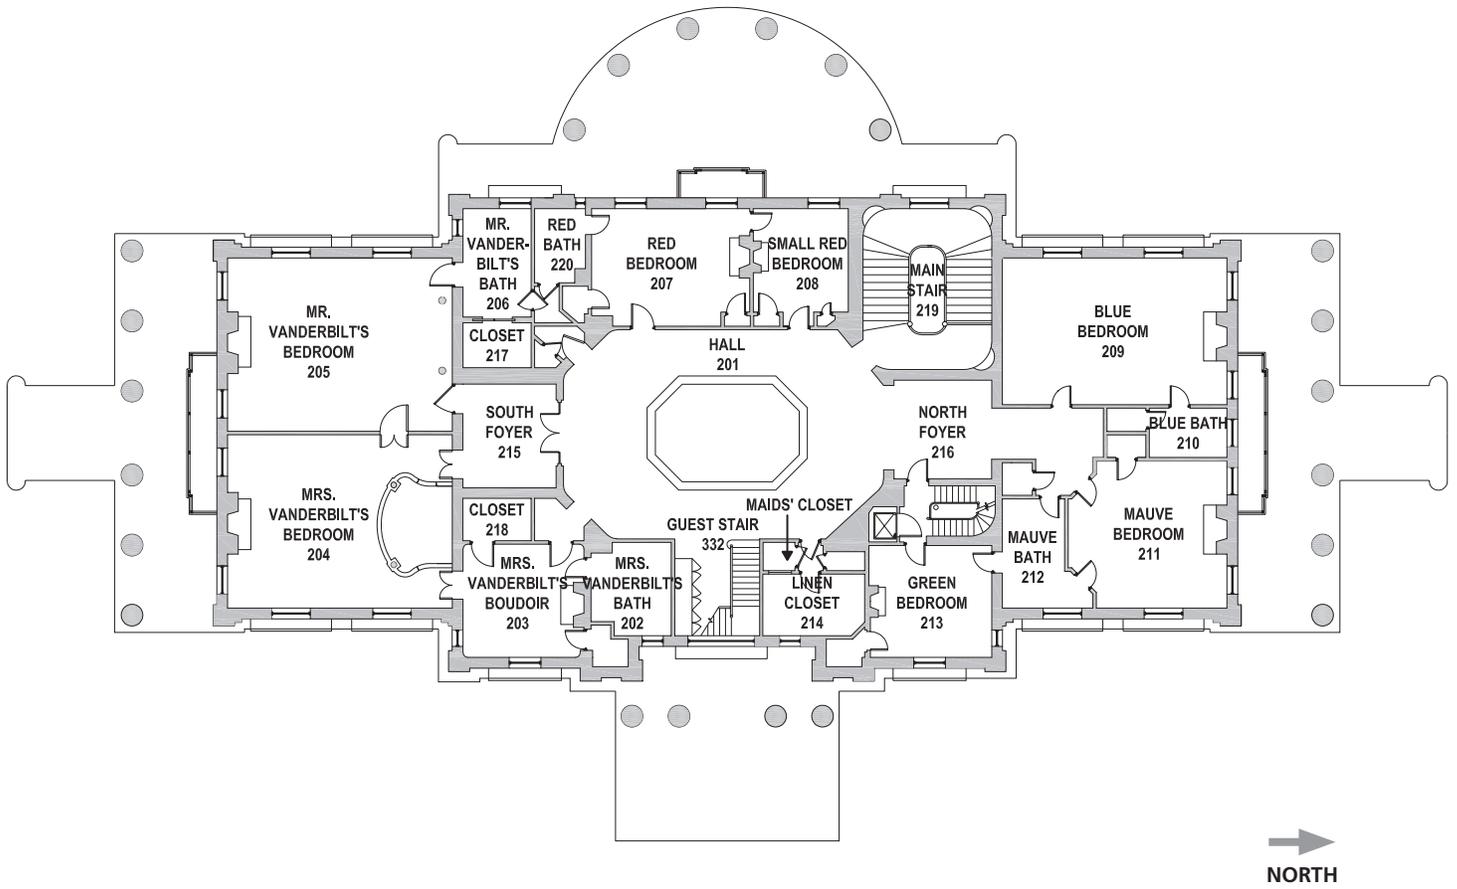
Vanderbilt Mansion second floor key plan. JGWA.
